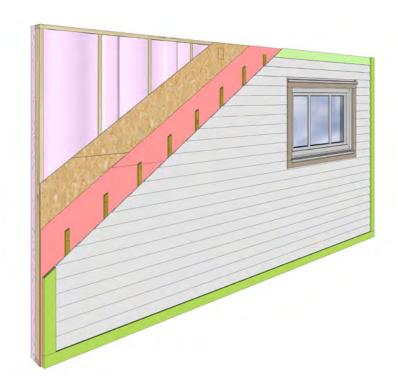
Retrofit 2x4 wall panel overview (green highlights indicate site-applied perimeter joint/tie-in components)
